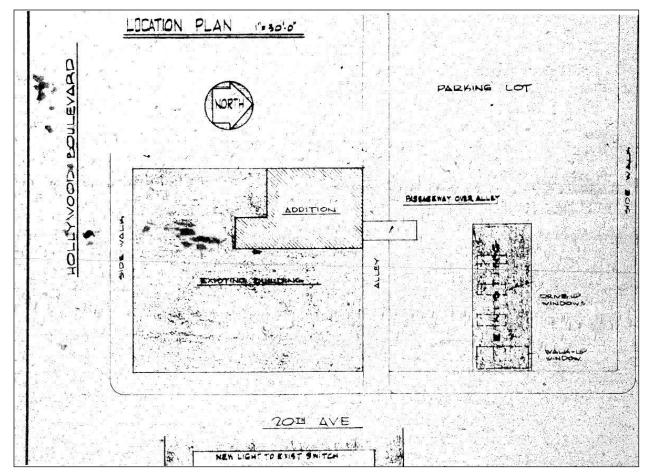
Page from the 1965 Addition and Renovation plans, showing the location of the addition on the northeast corner of the building (City of Hollywood Records and Archives).
